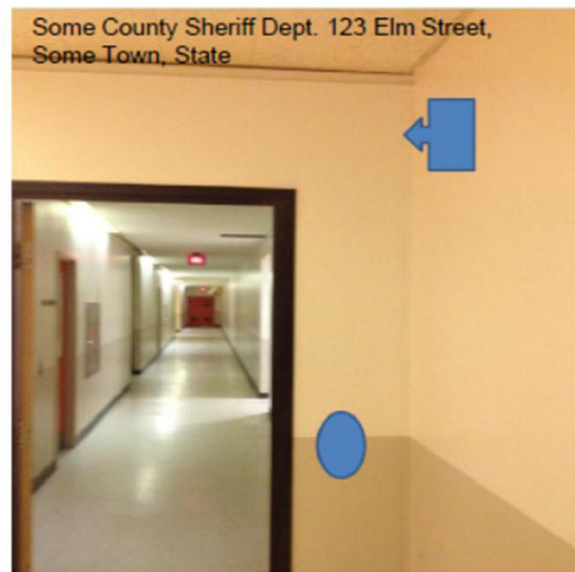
Example of ground-level photograph showing proposed attachment of new equipment
